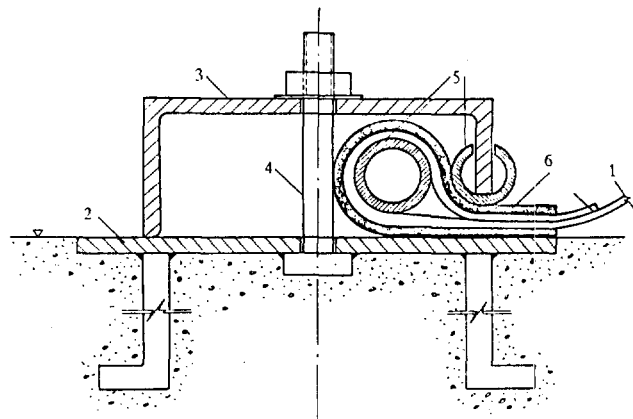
Anchorage: 1-membrane, 2-steel plate, 3-channel, 4-built-in stainless steel bolt, 5-steel pipe, 6-rubber plate
